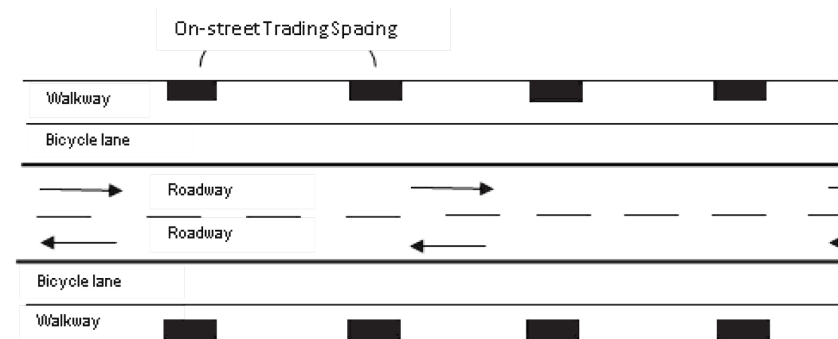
Image showing street plan where street trading is accommodated (Complete Streets Design Guideline, 2019)
